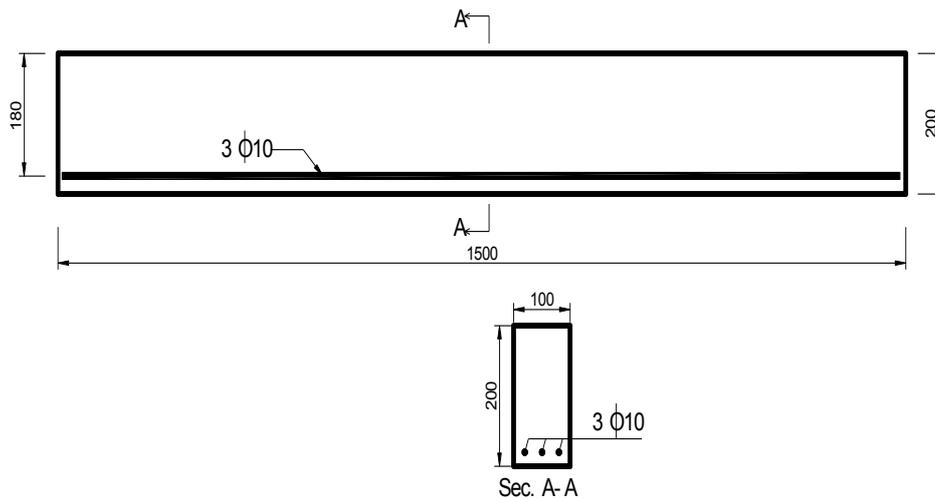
Details of beams reinforcement (All dimensions are in millimeter)
